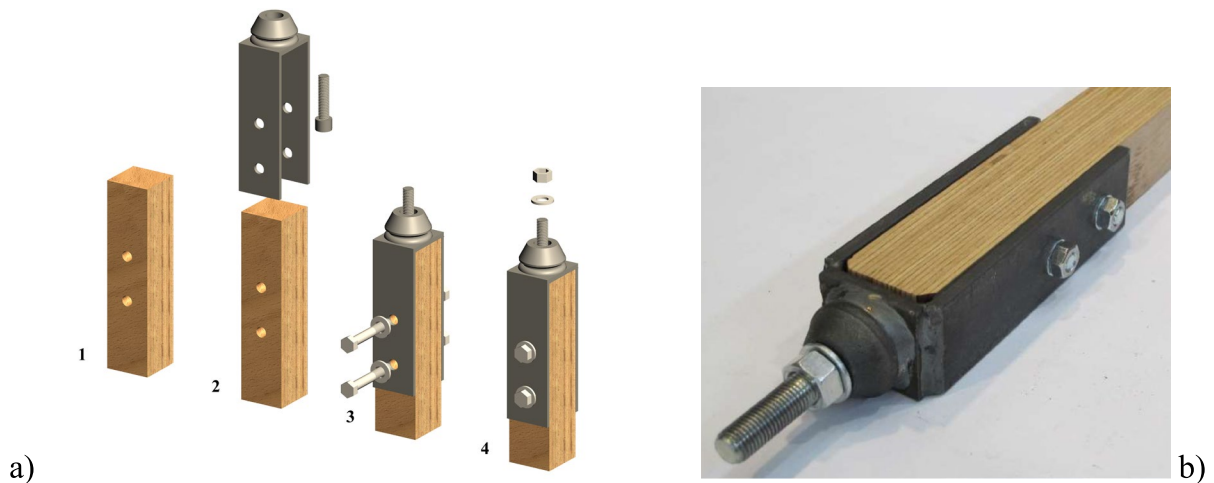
Type B connection: a assembly stages and b specimen before test
